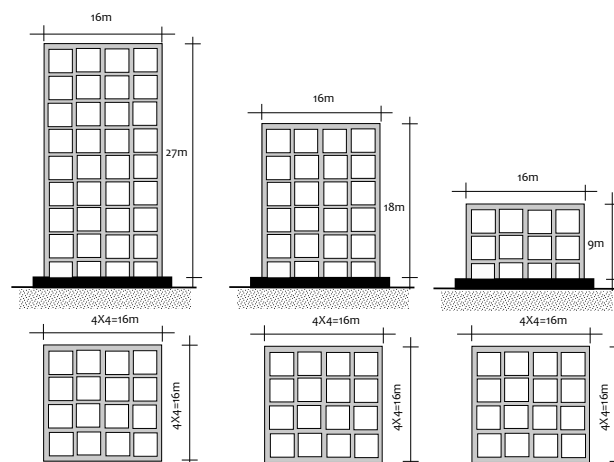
Plan and Elevation details of buildings with 3, 6 and 9 stories
